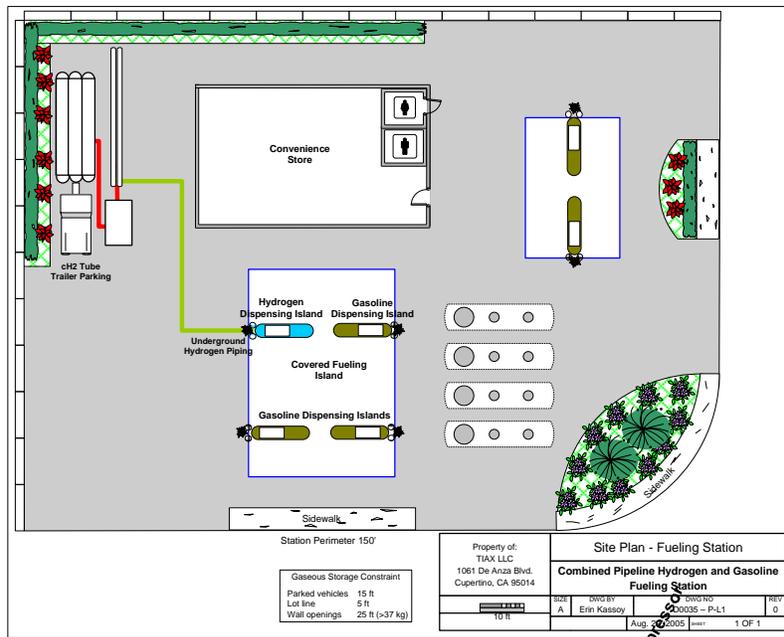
Compressed H2 Tube Trailer Fueling Station Site Plan
